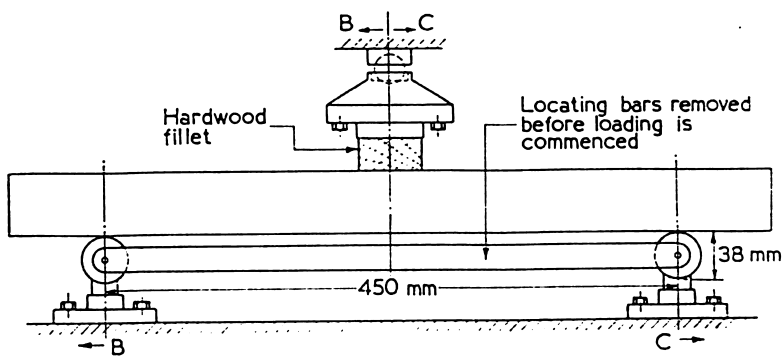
Arrangement of loading for transverse strength test; side elevation
